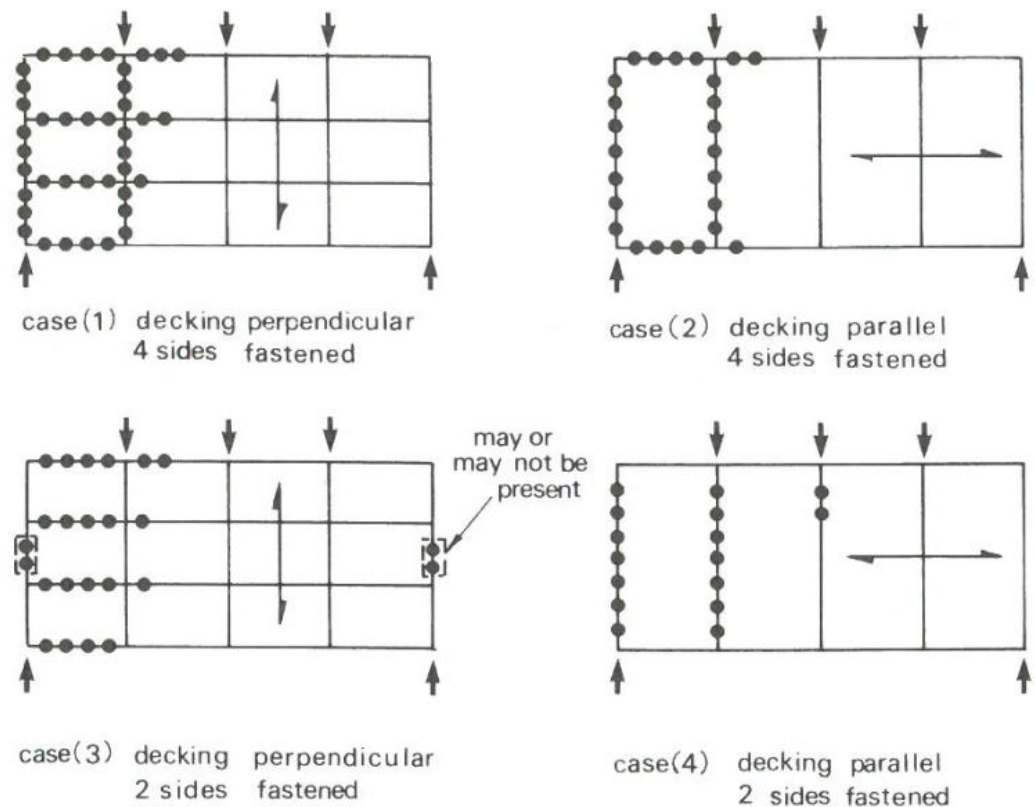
Alternative fastener arrangements (J.M. Davies and E.R. Bryan, 1982, P.18)
